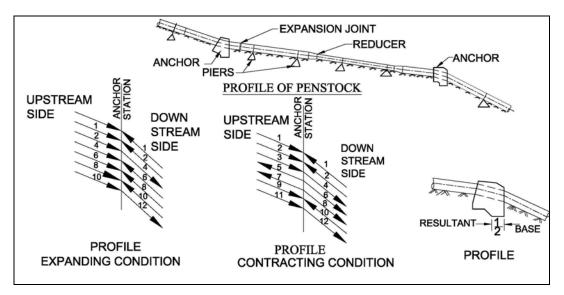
Penstock Specials (Source: USBR-Engineering Monograph 3- Welded Steel Penstocks)
